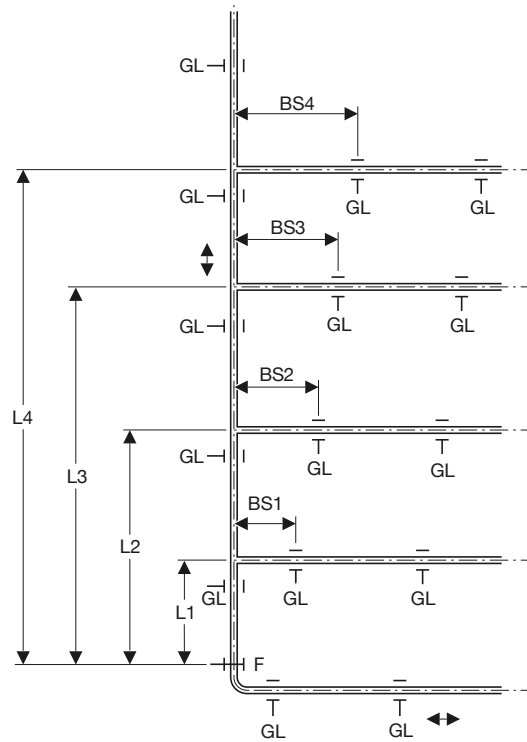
Expansion compensation by bending leg with anchor point in bottom floor.
